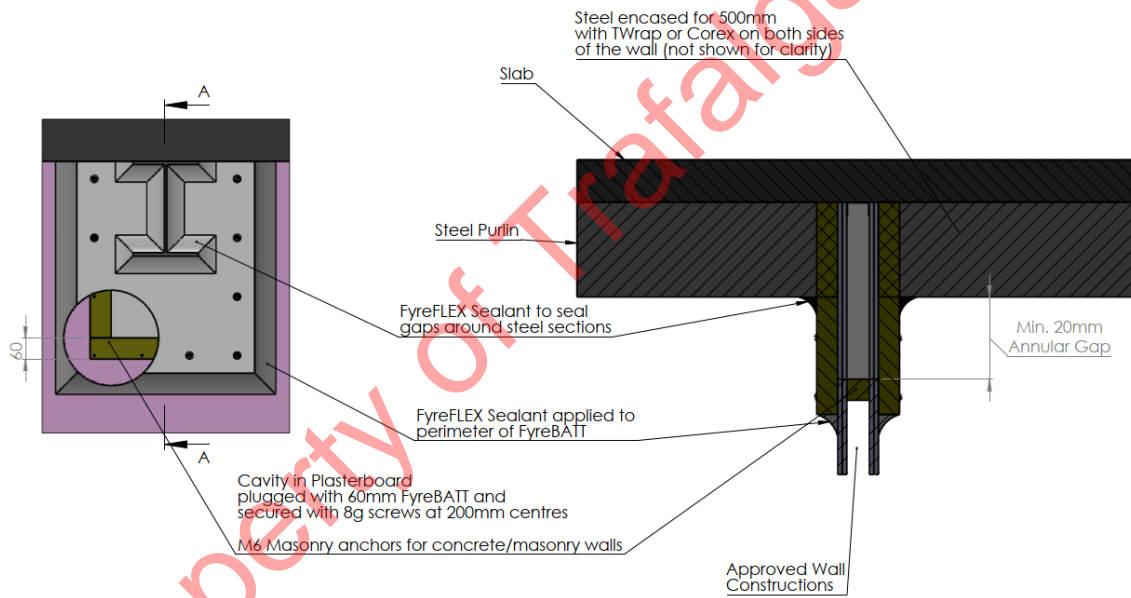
Proposed steel beam/purlin penetration system – detail 9
